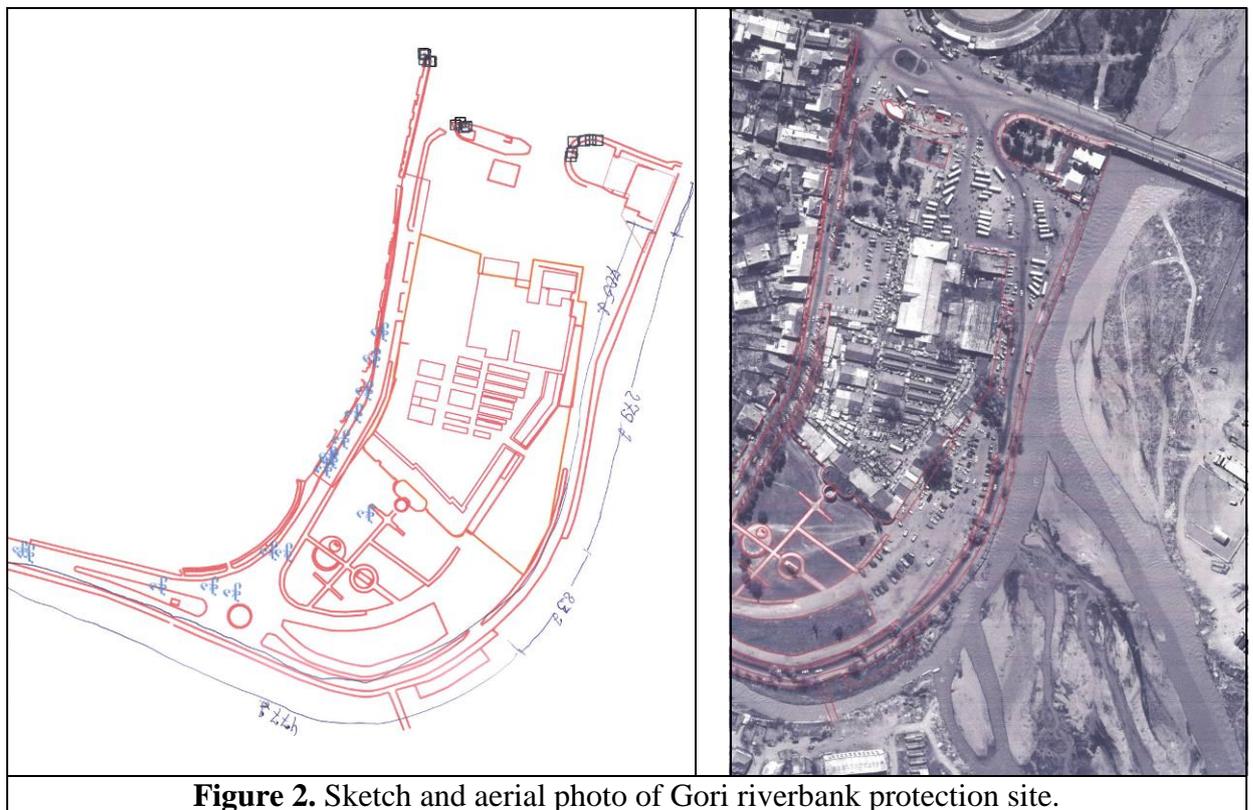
Sketch and aerial photo of Gori riverbank protection site.
